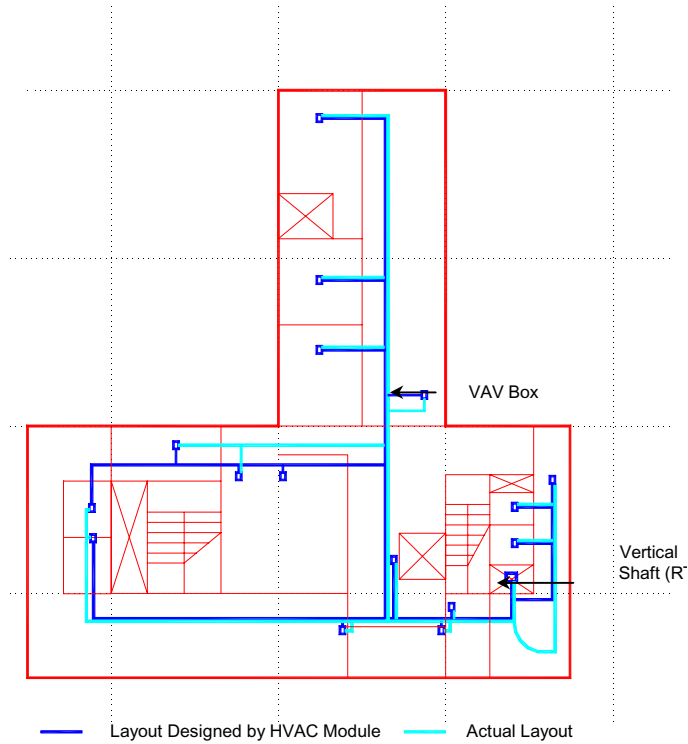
Automatic Duct Layout Generation: Core Section, Building
